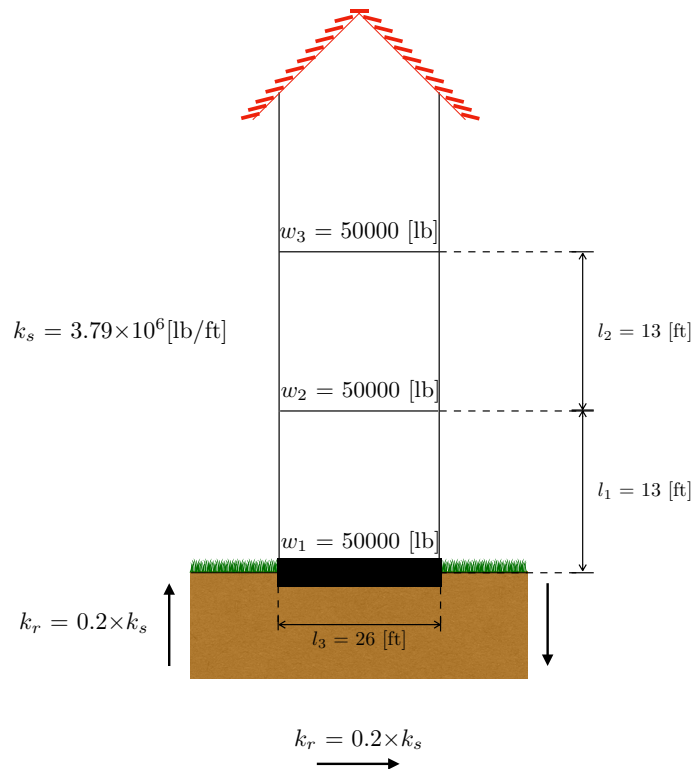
Three story steel moment frame building seated on a surface mat foundation, and its corresponding constitutive parameters, used to solve the four benchmark problems herein proposed.
